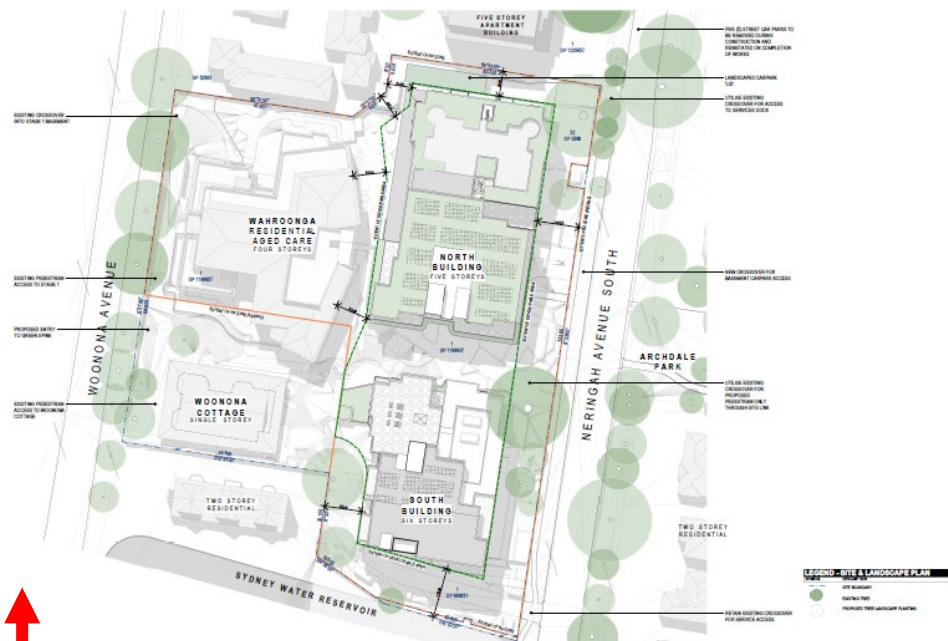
Proposed site plan. (Source: Bickerton Masters Architects)
